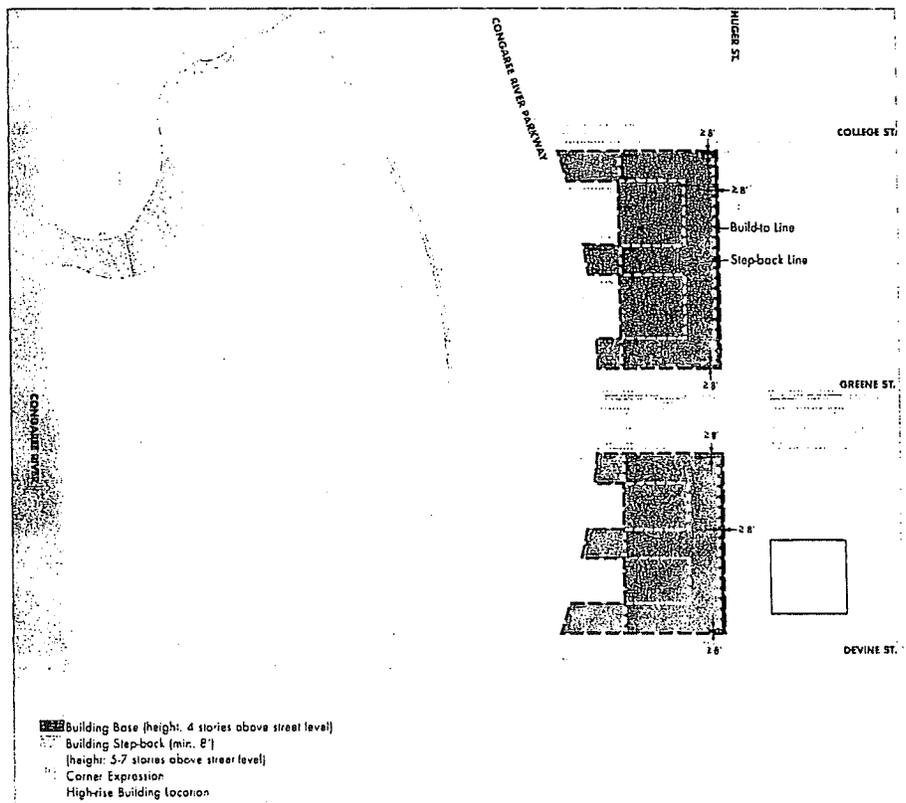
GREENE STREET OVERLOOK BUILDING ENVELOPE
